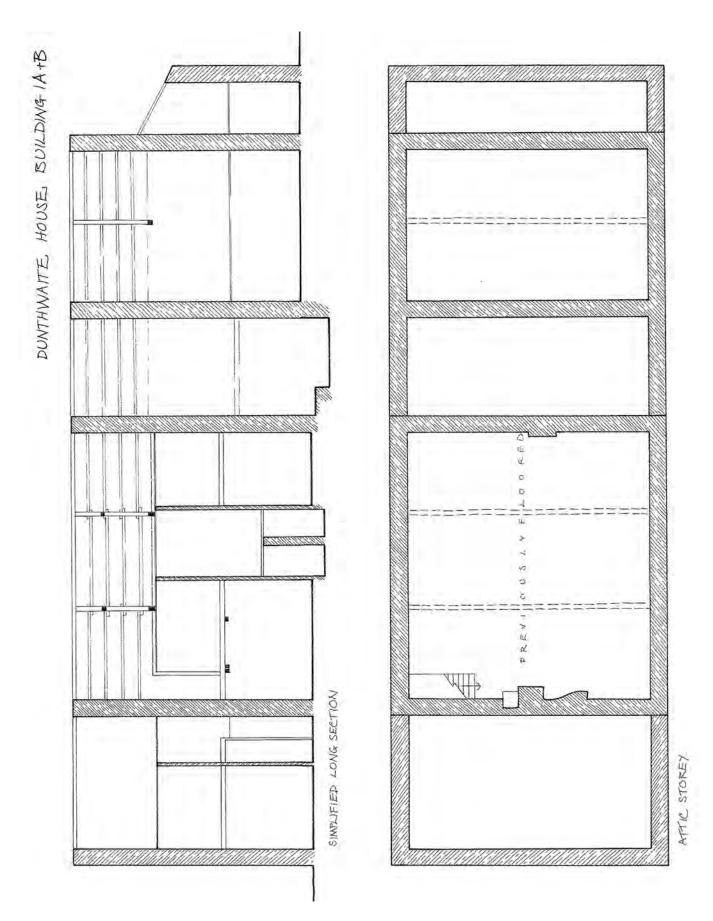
1986 survey, Building 1 longitudinal section and attic plan (Higgins 1986).
